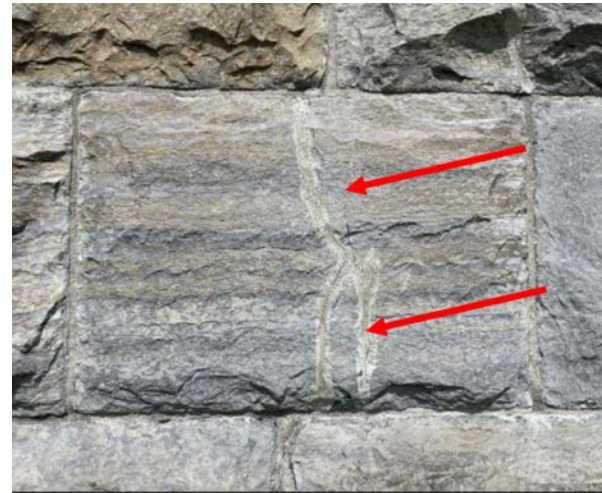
Previously repaired crack and hairline crack extending from previous repair. Jablonski
